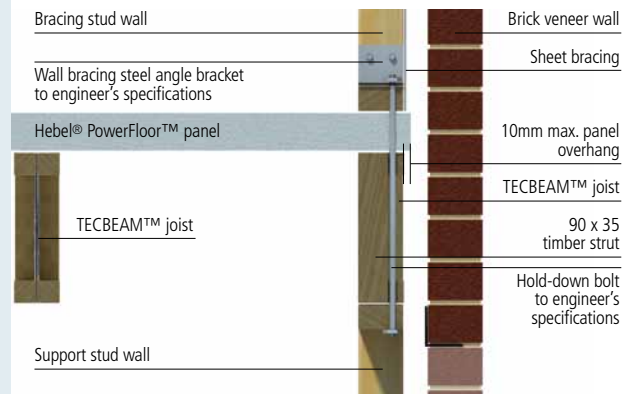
Hold-down of internal bracing wall parallel to TECBEAM™ joists
